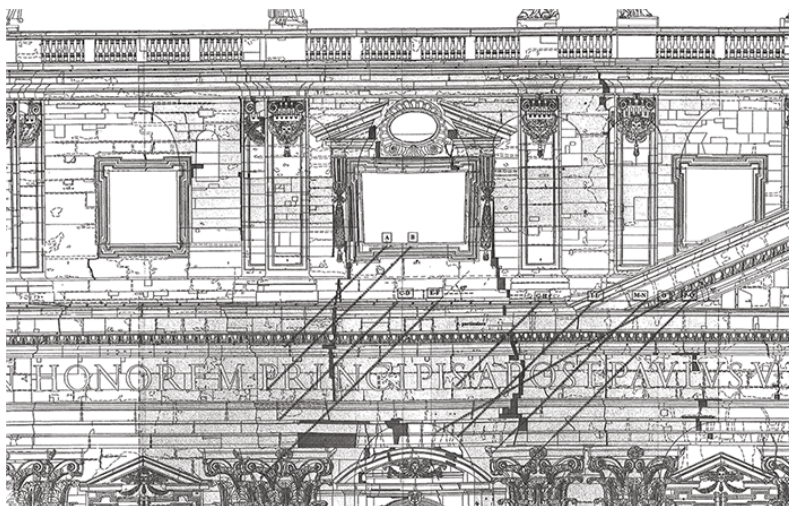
Detail 1: crack-stitching system applied to the Façade crack pattern (Cretti) of St. Peter's Basilica (location indicated in Figure IV.14).
